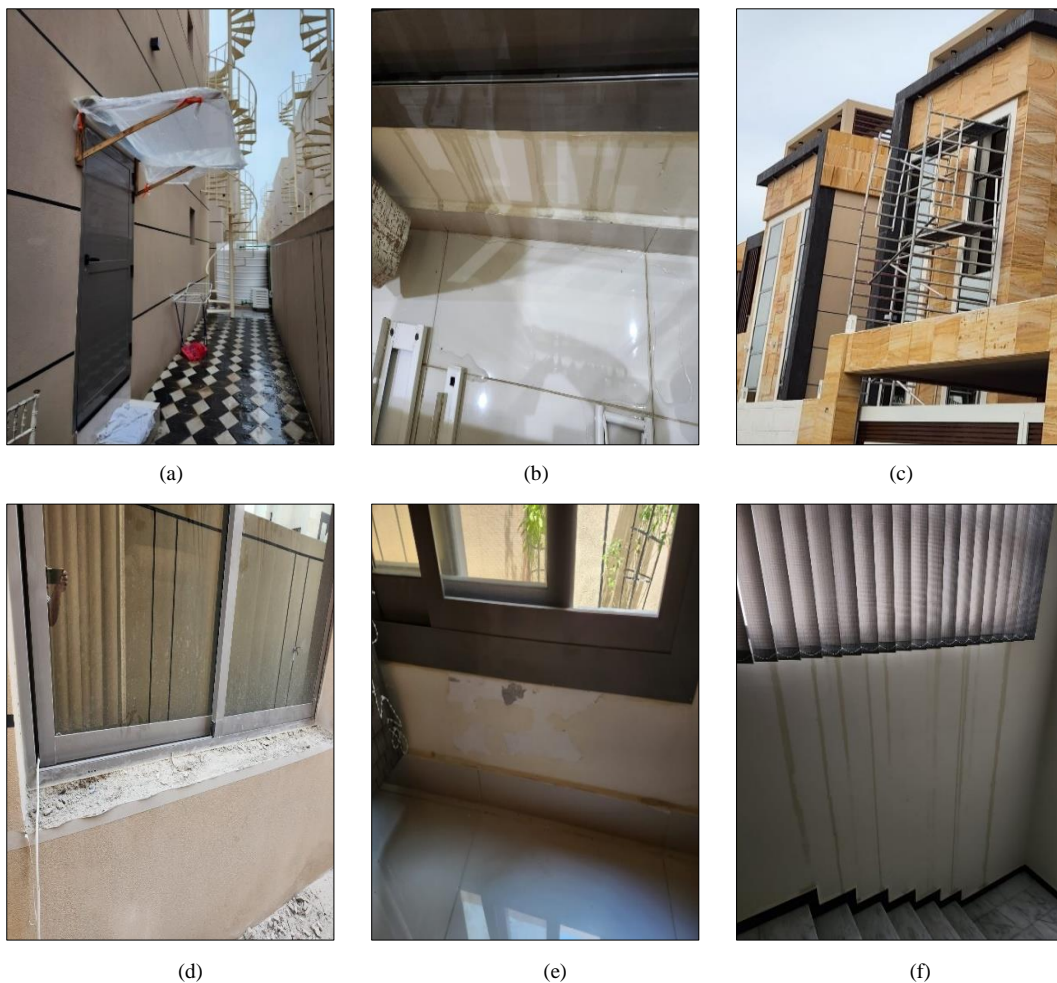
(a) At door rainwater penetration, (b) At window rainwater penetration, (c) Rainwater penetration curtain wall, (d) Sill sloping retrofit, (e) Paint peel off, (f) At wall rainwater marks
